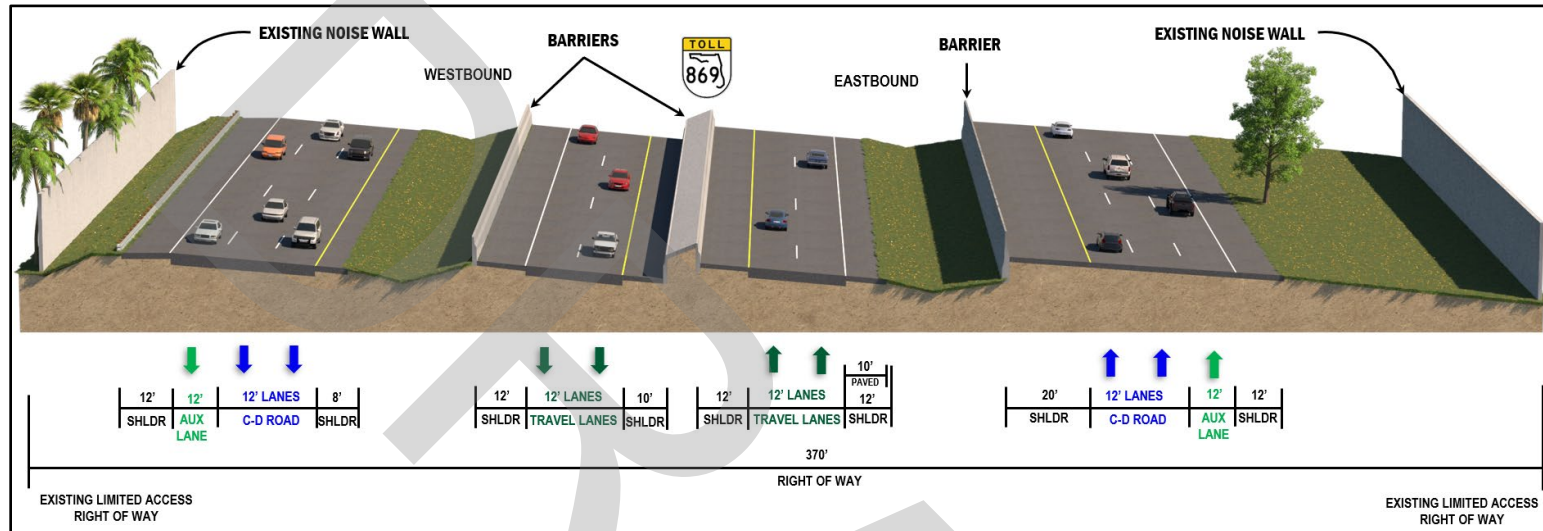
Existing Roadway Section between Lyons Road and Florida's Turnpike
